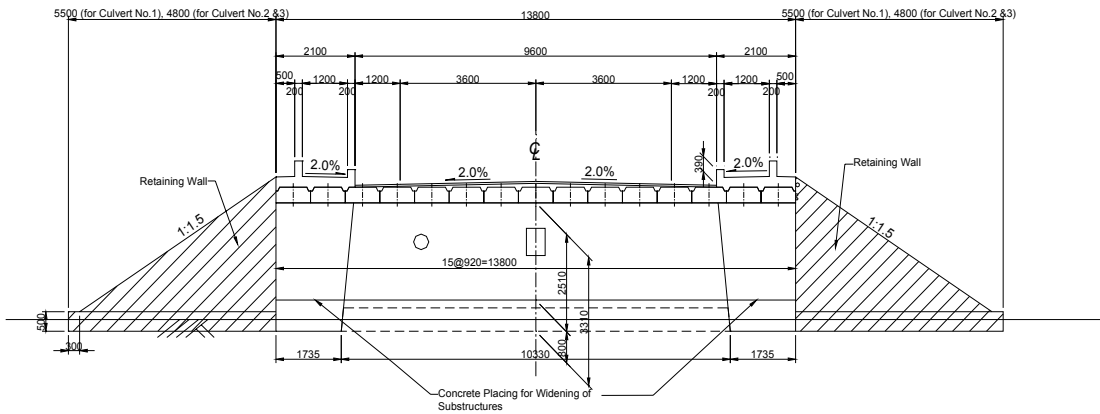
Front View of Culvert with Retaining Walls (Malakal Causeway)
